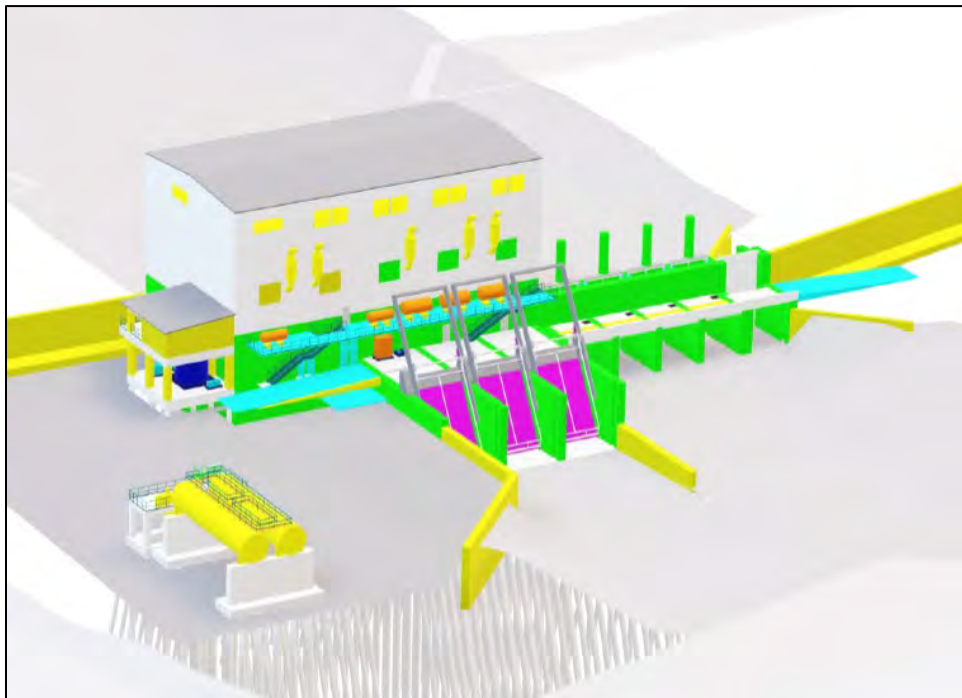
Typical Site Plan of a Pump Station with Large Pumping Capacity
